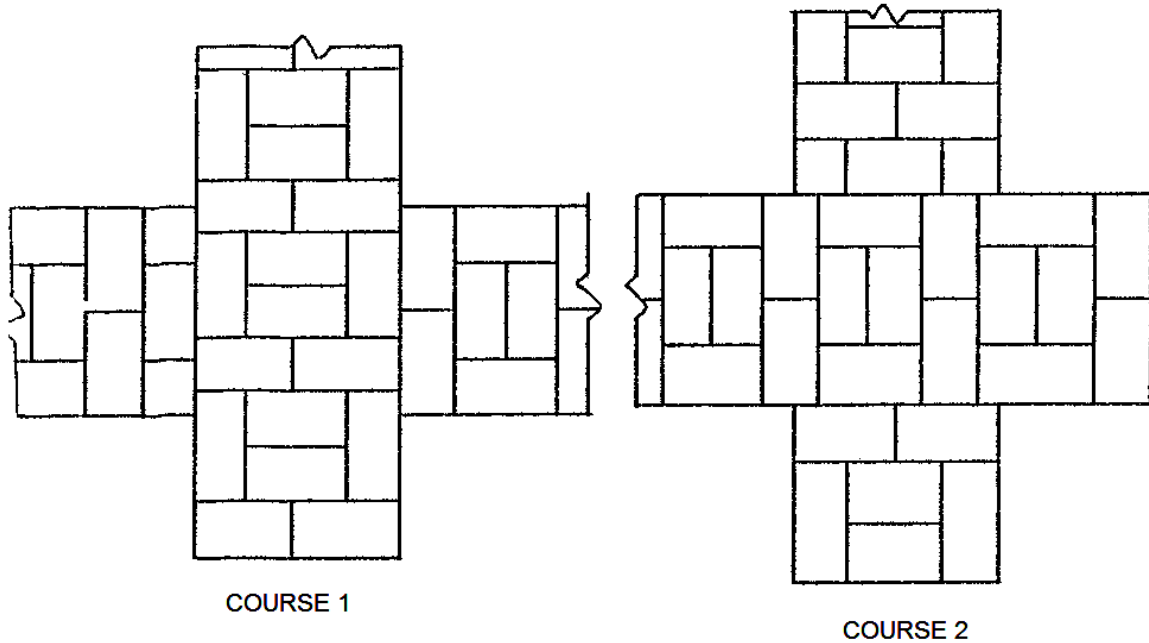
Alternate plan courses of a cross intersection in two-brick walling
